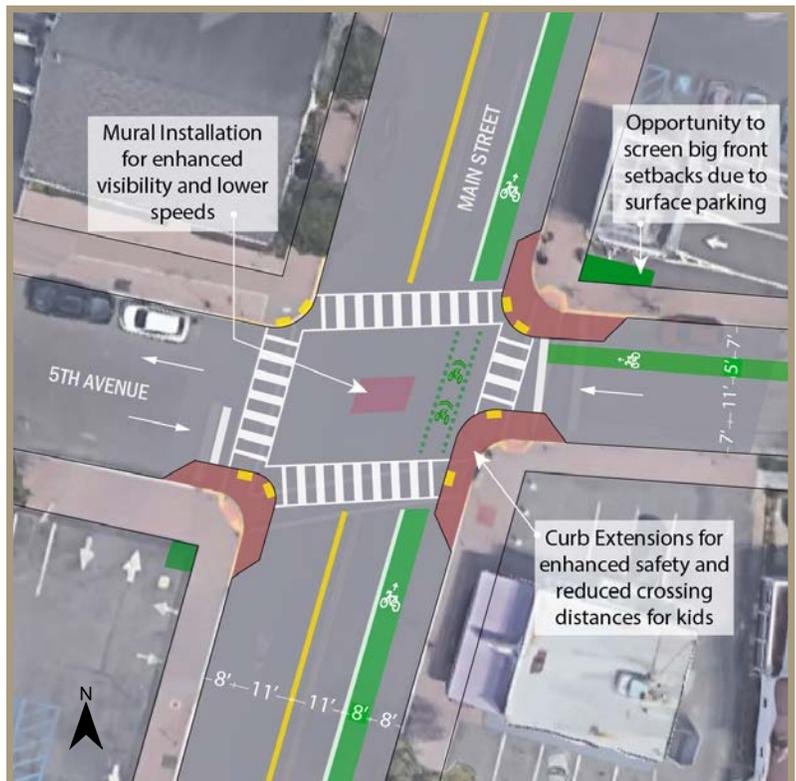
Proposed improvements on Main Street and Fifth Avenue intersection.
